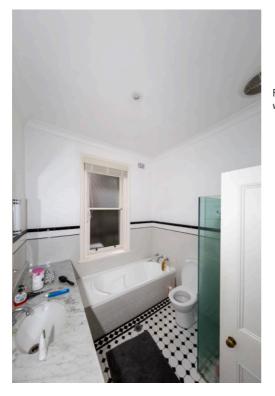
(Left) bathroom with modern fit out, modern ceiling. The window is original.
